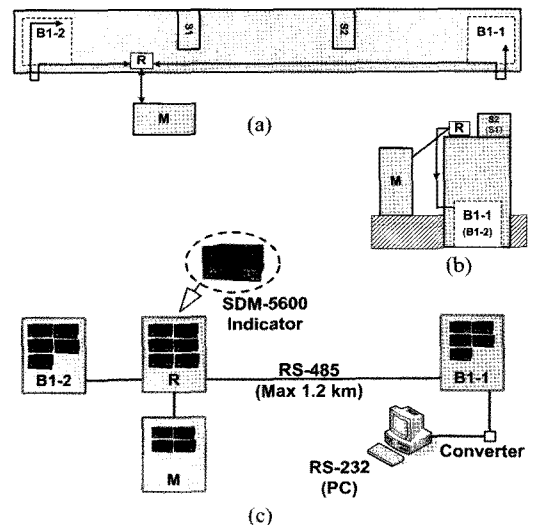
Schematics of the test building's (a) plan, (b) elevation, and (c) signal processing system.
